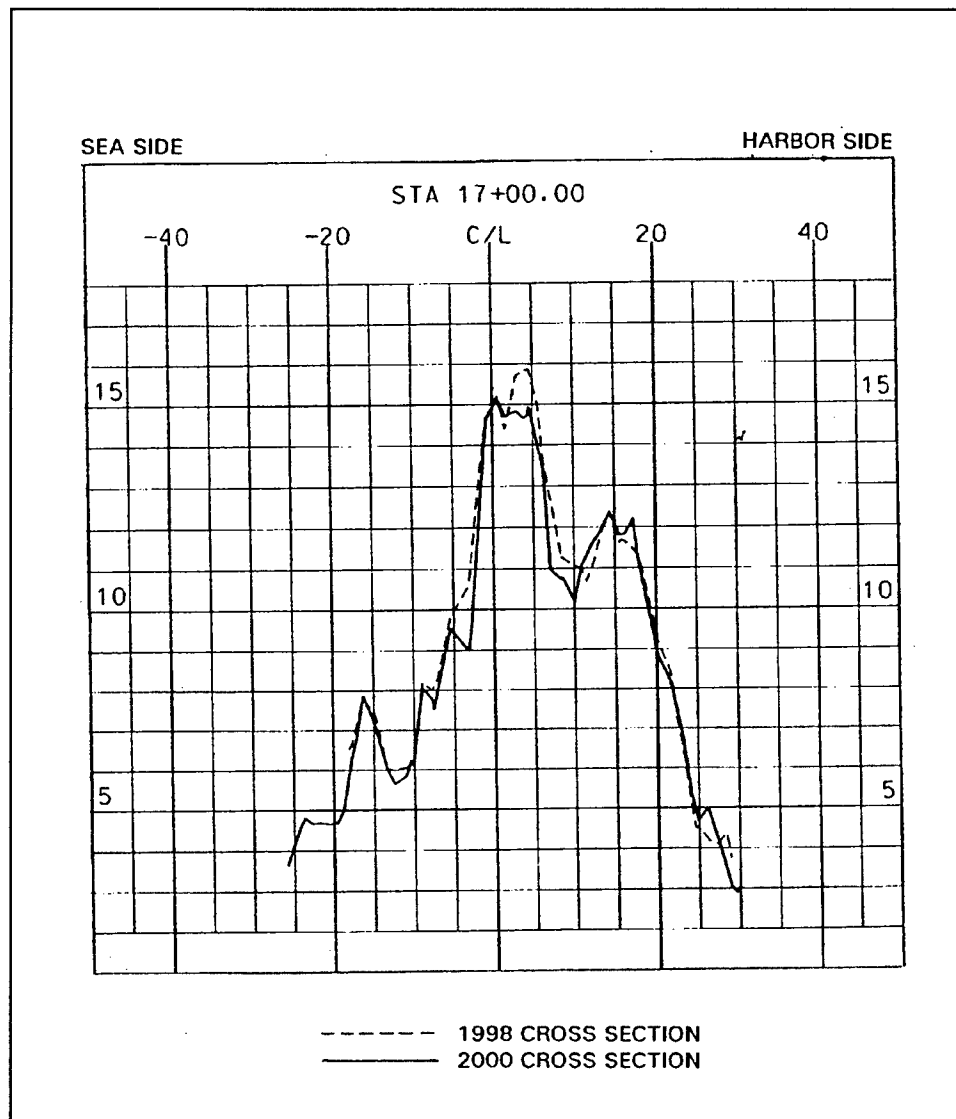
Cross sections of Morro Bay outer south breakwater, sta 17+00
